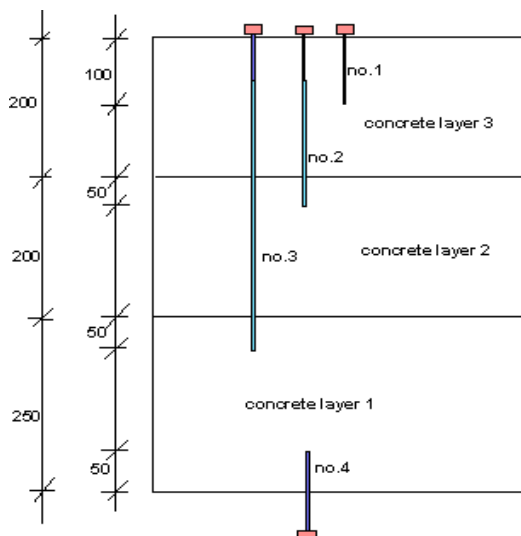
The set-up of the concrete test (from Section 4.4.2).
